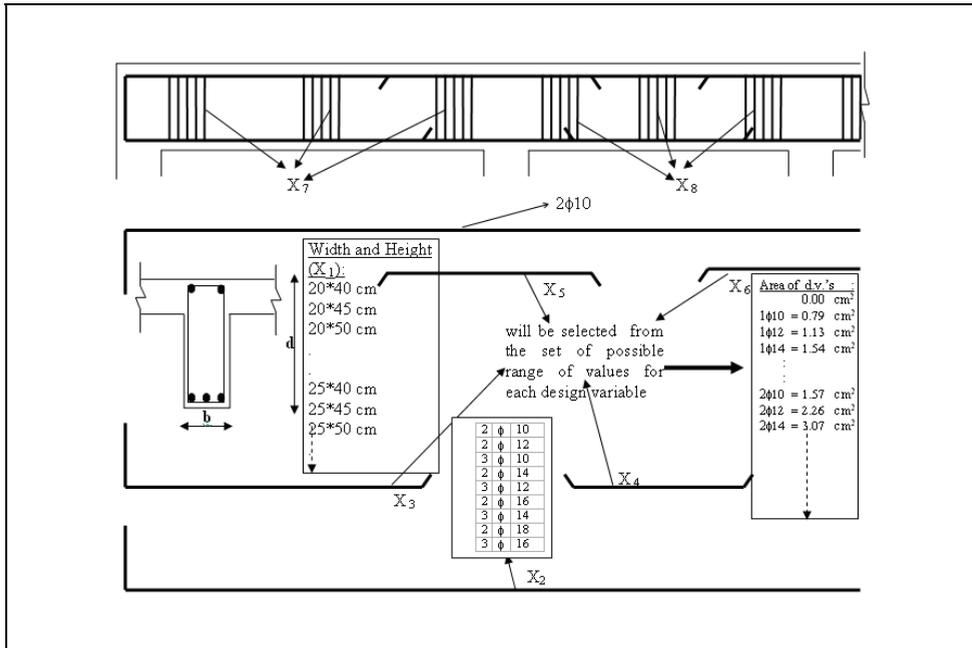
Design Variables for Four Span Symmetrical Reinforced Concrete Continuous Beam
